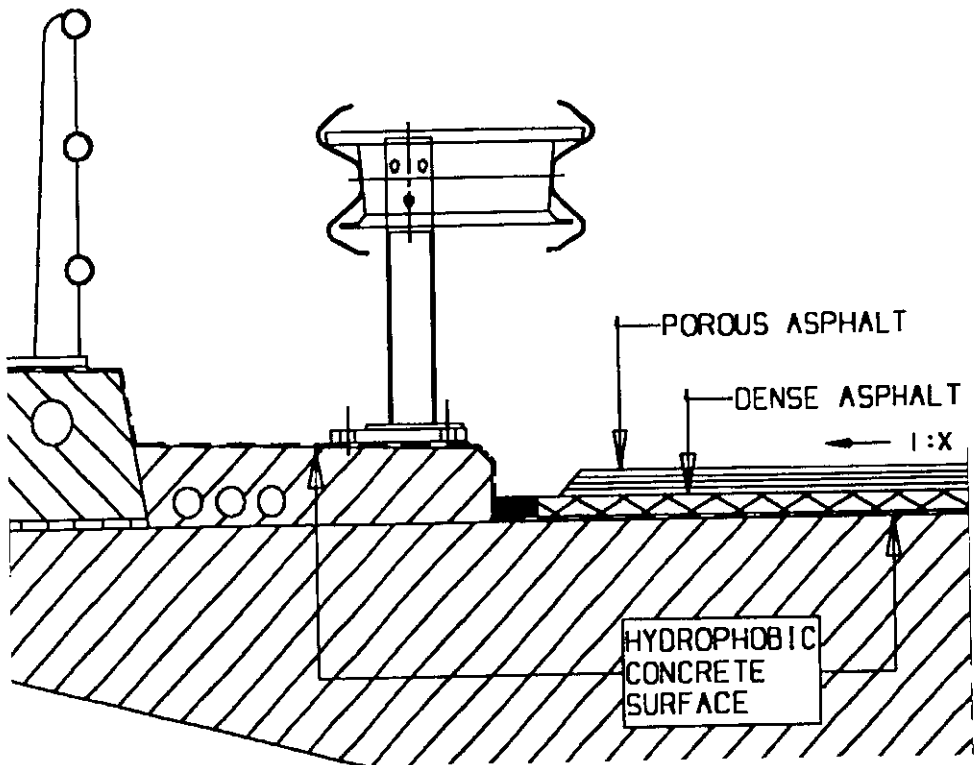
Typical detail cross section of a viaduct with porous asphalt
